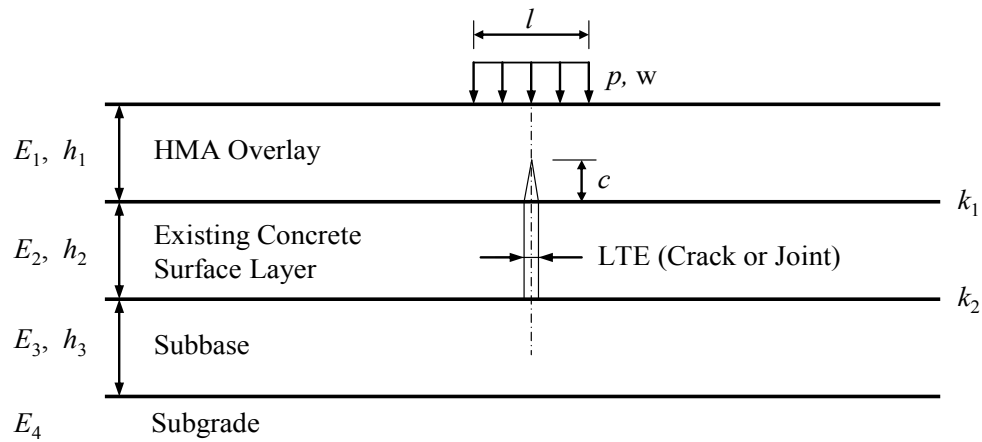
Diagram of HMA overlay on jointed concrete pavement-bending.
